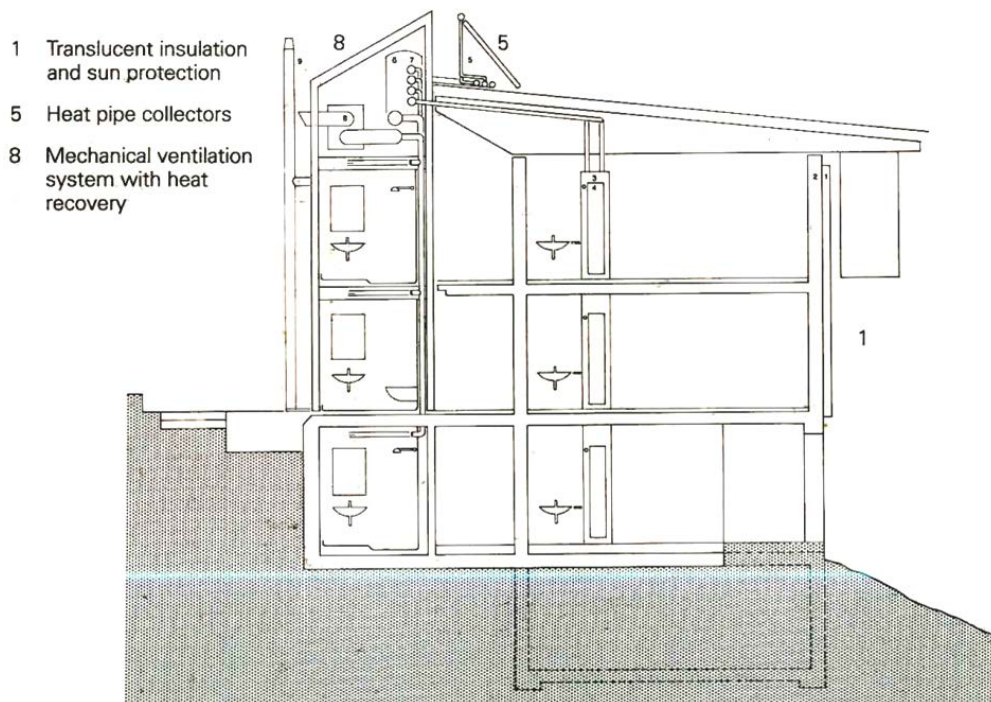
Guest Building, Windberg, Cross section with Installed utilities
